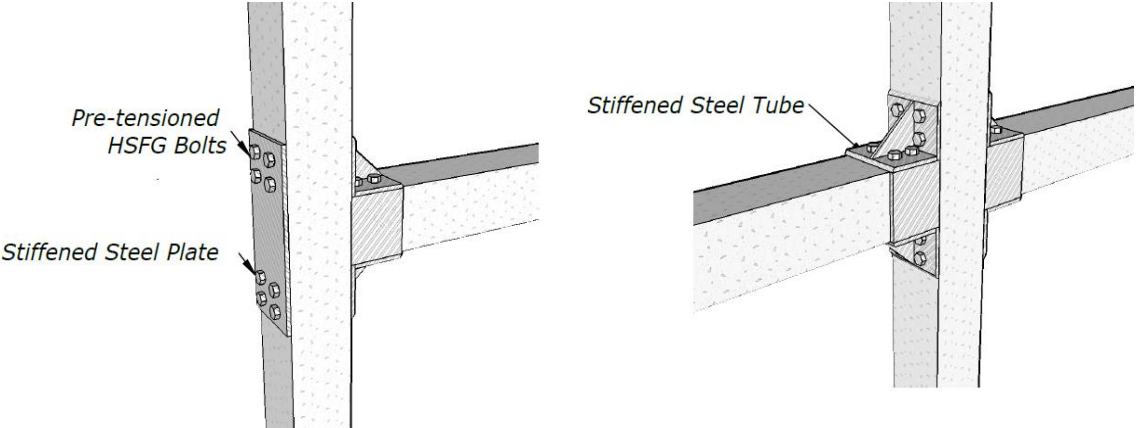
Beam-column connection system using steel tube, and HSFG bolts
